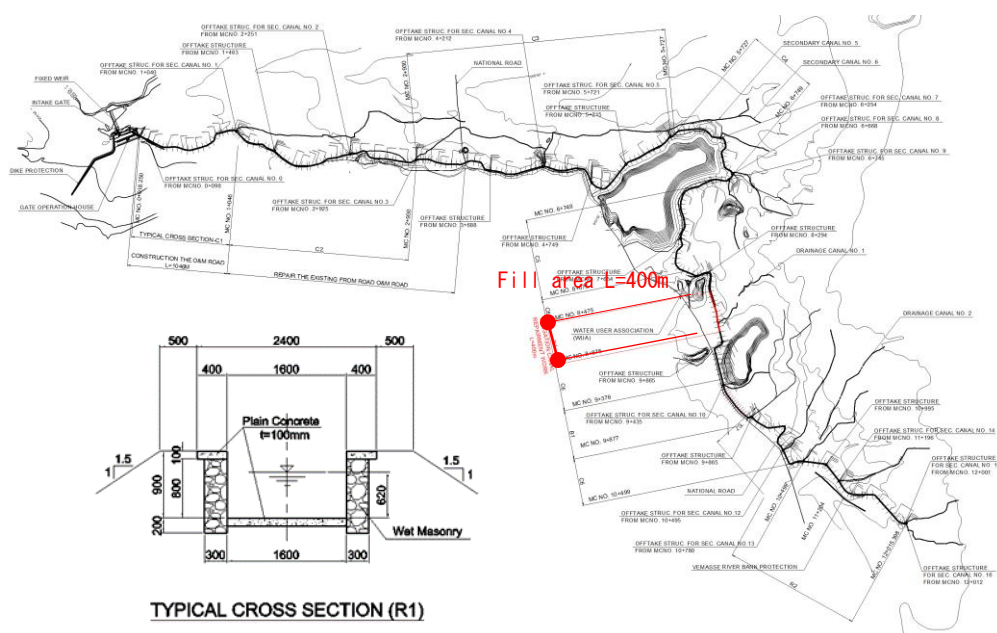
Location map of embankment section, typical cross section of canal
